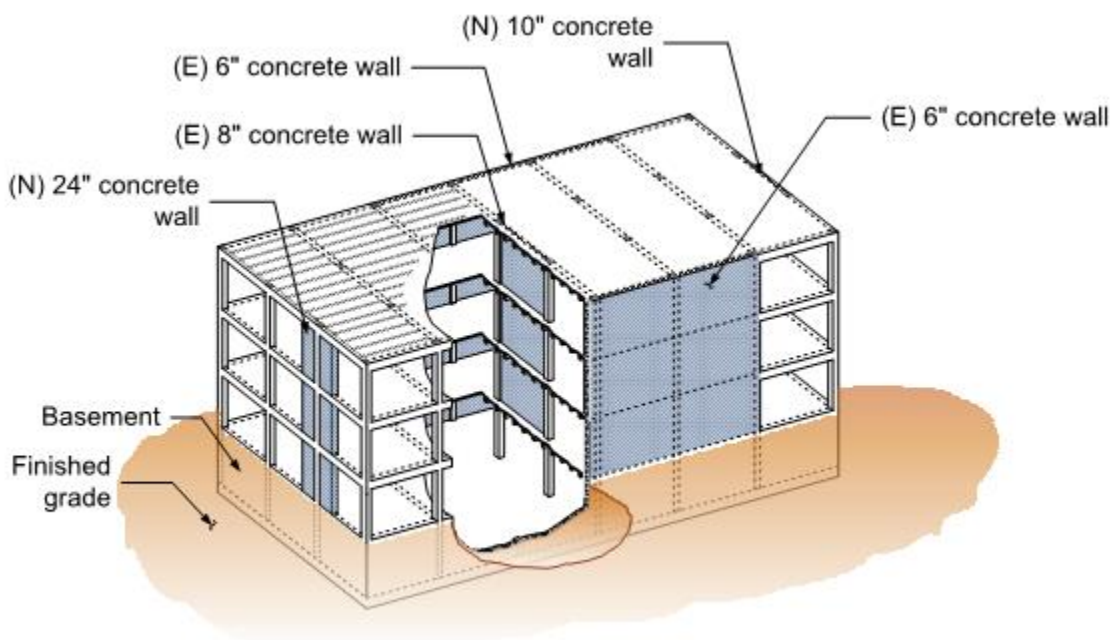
FEMA P-2006 concrete shear wall design example building.
